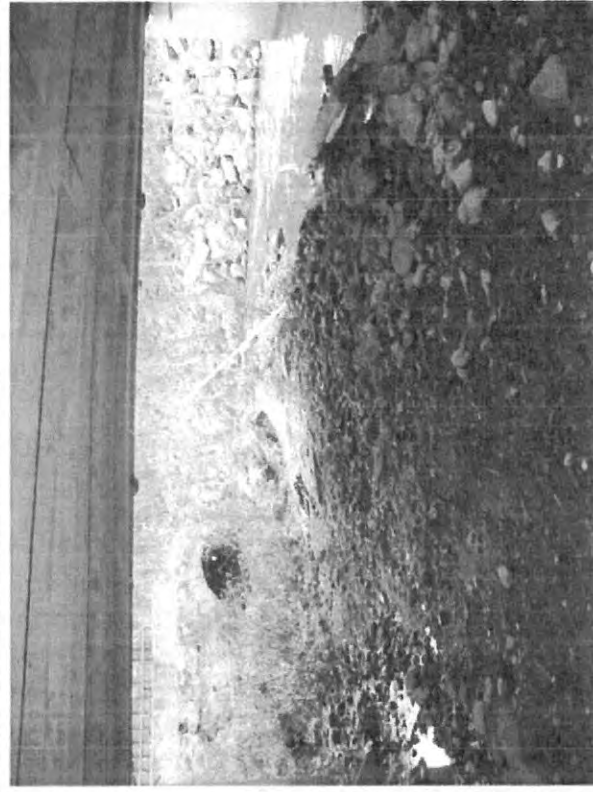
View of Heavy Silt & Stone Buildup Under Structure.
